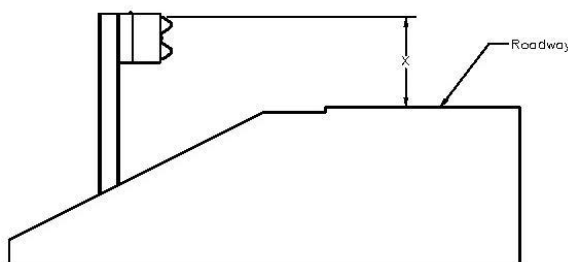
Guardrail Height Measured to the Ground at Roadway Edge
